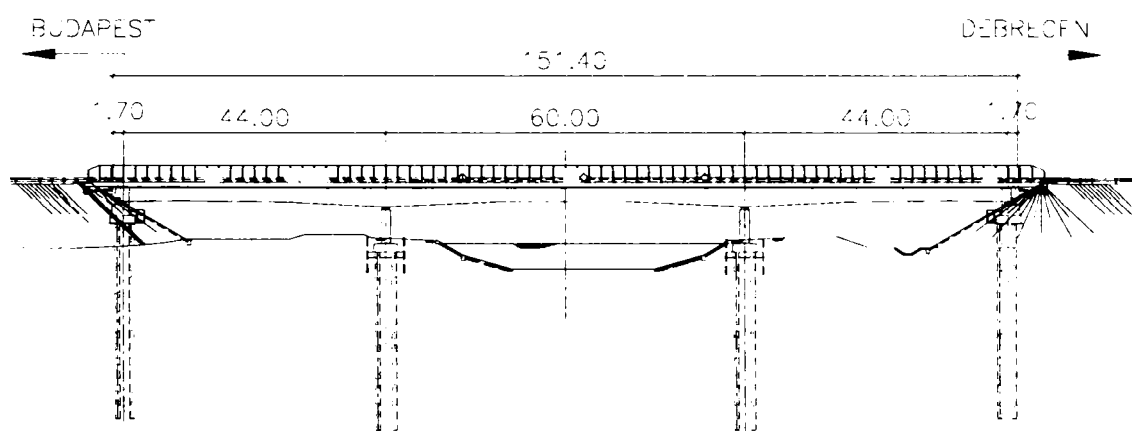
The elevation drawing of the bridge over the Eastern Main Channel
